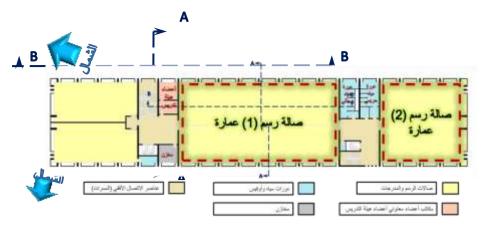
Horizontal skylight of 4th floor of the University. Two drawing rooms are shown.
